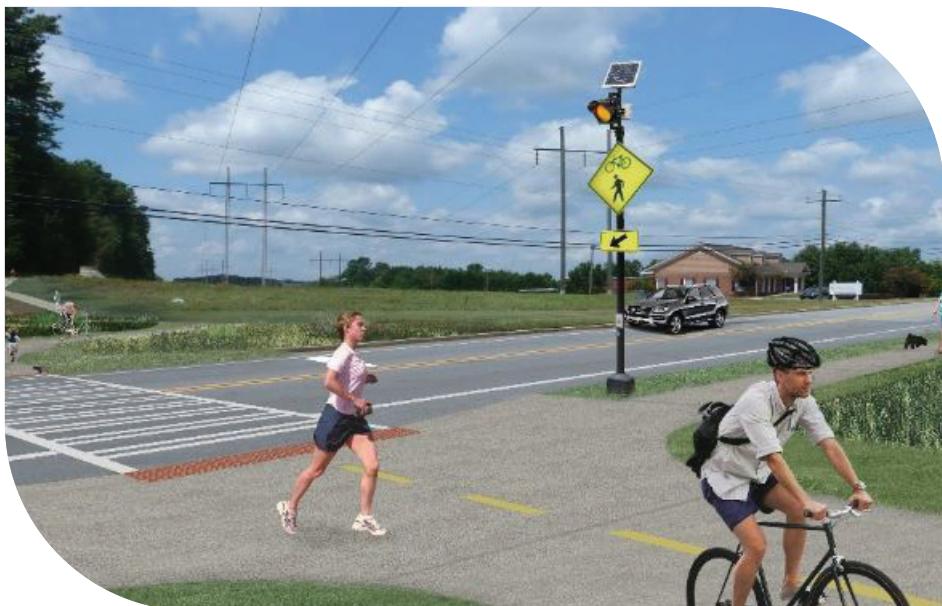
Rendering of trail road crossing from the Gwinnett Countywide Trails Master Plan; image by Kimley-Horn.
